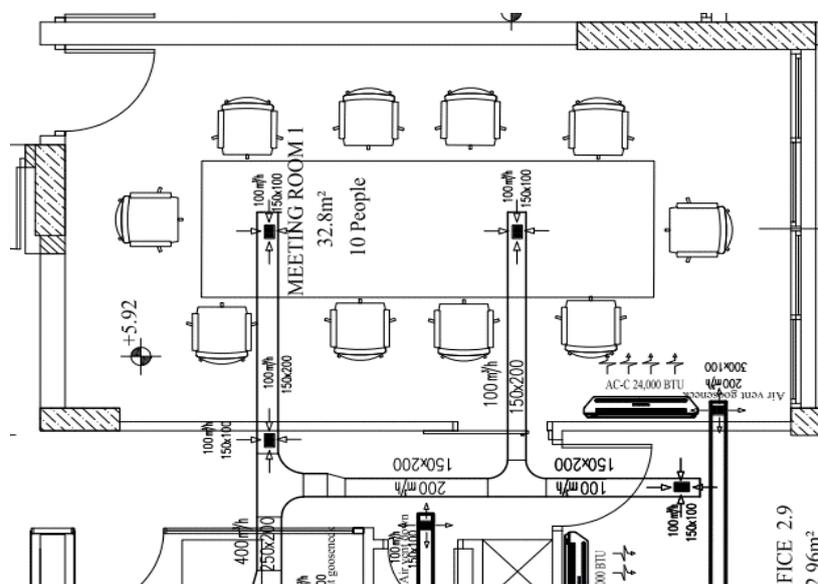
Planning scheme of exhaust ducts on the meeting space and fresh air gooseneck inlet vent
